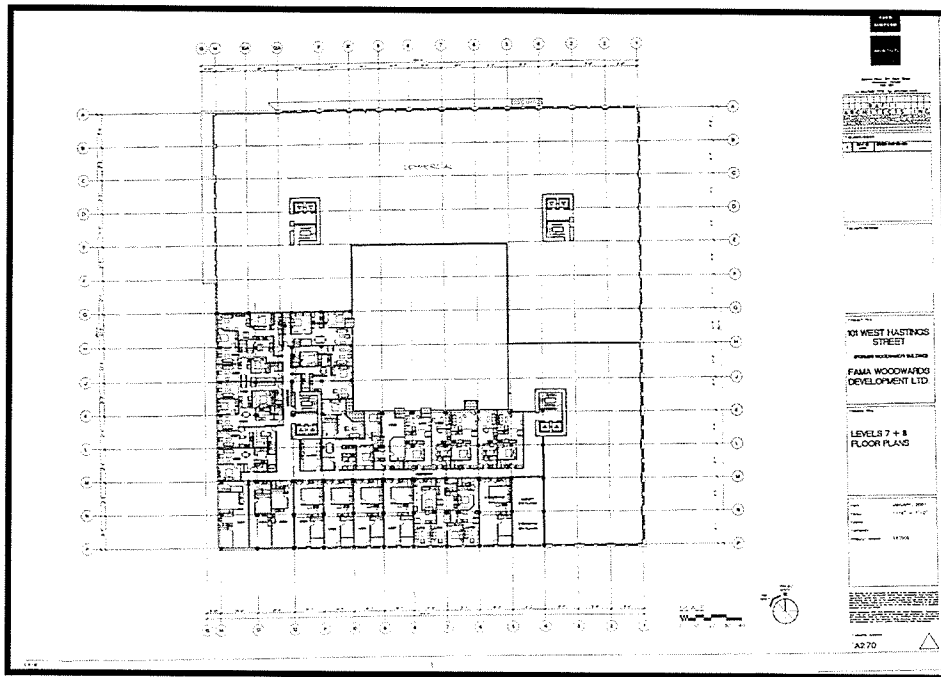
Proposed Levels 7 & 8 Floor Plans compliments of Davidson, Yuen and Simpson
